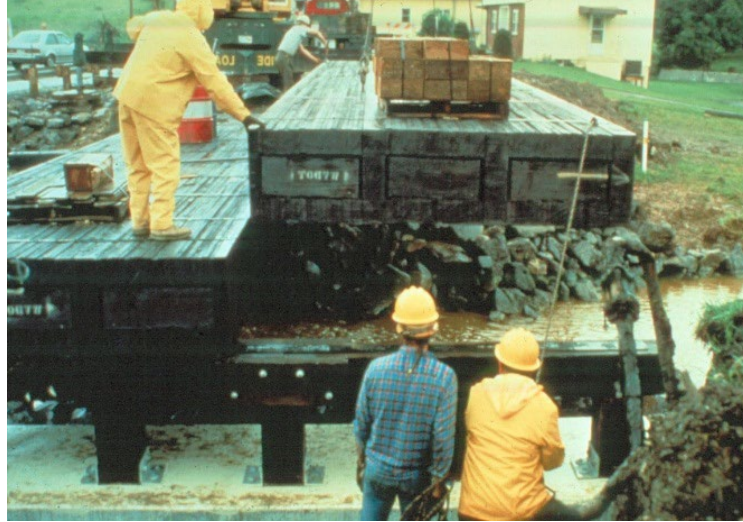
Structural Composite Lumber Deck Using Box Sections
